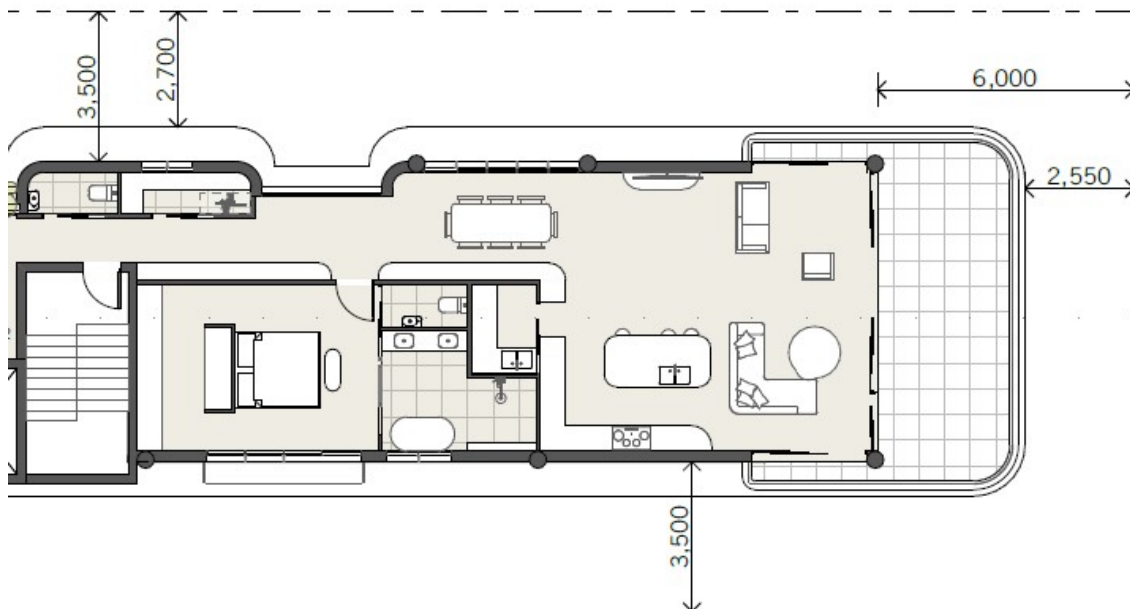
Partial level 8 floor plan (Source: Lightwave Architecture)
